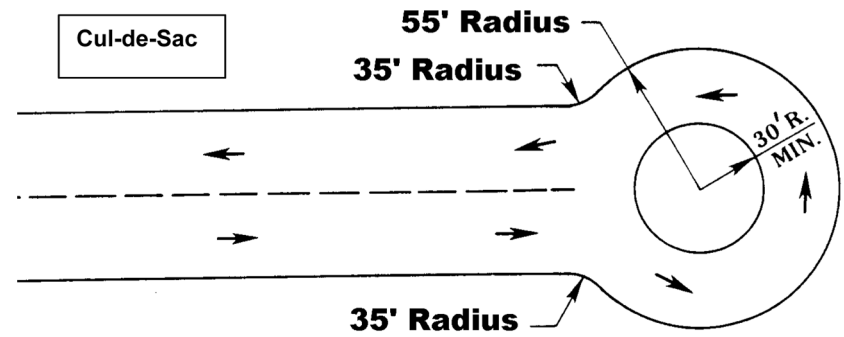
Typical Layout: Cul-de-Sac
